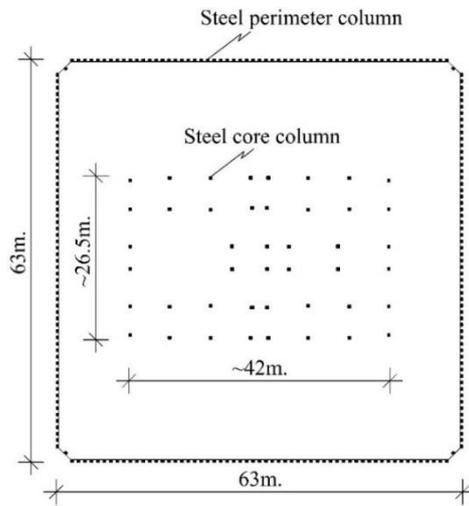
World Trade Center Twin Towers, New York, 1972 (Gunel and Ilgin, 2014)
